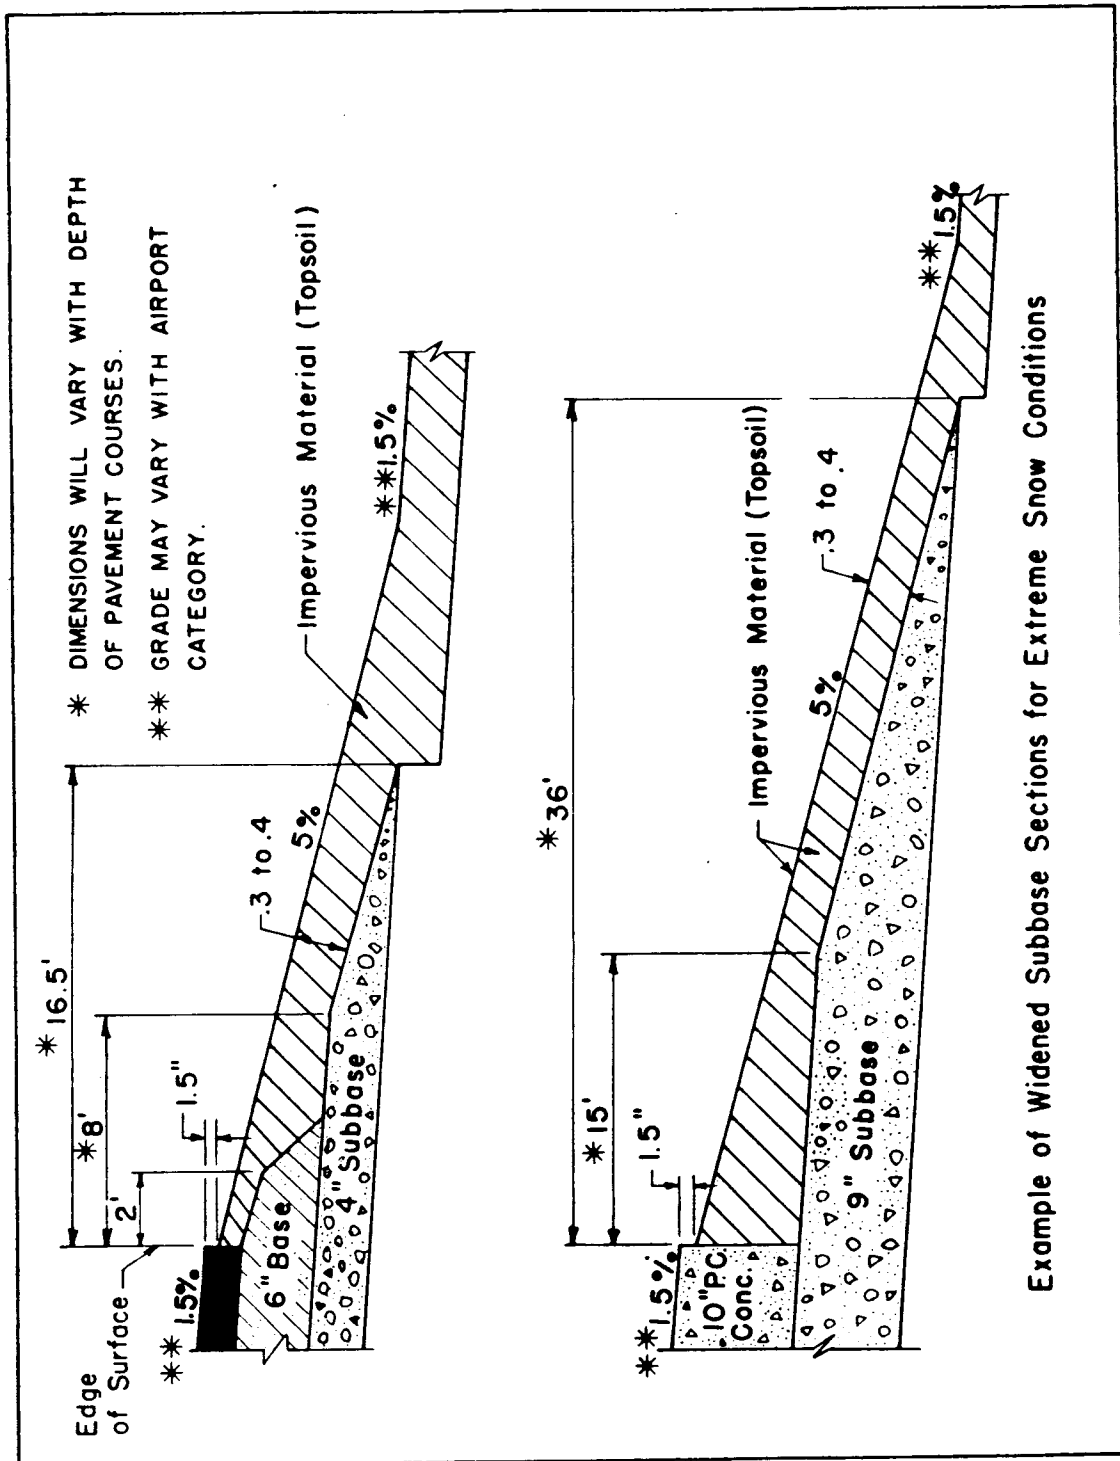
Example of widened subbase sections for extreme snow conditions.
